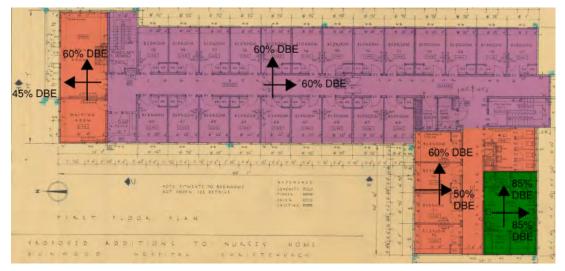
First Floor Ceiling Diaphragm - %DBE (IL2)
